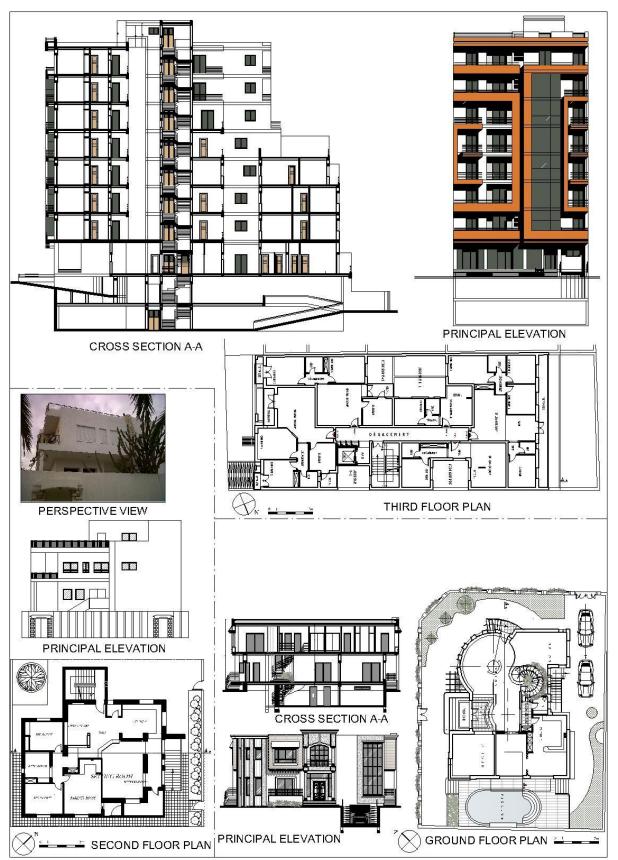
Architectural details of the selected houses in site 2: house D; house E; house F (from upper to lower and left to right respectively).
